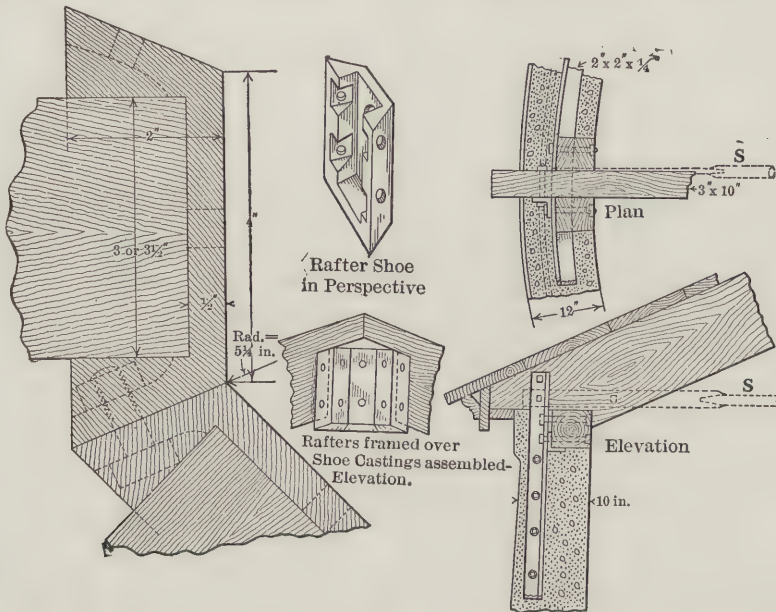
PLAN DETAIL OF RAFTER SHOE
